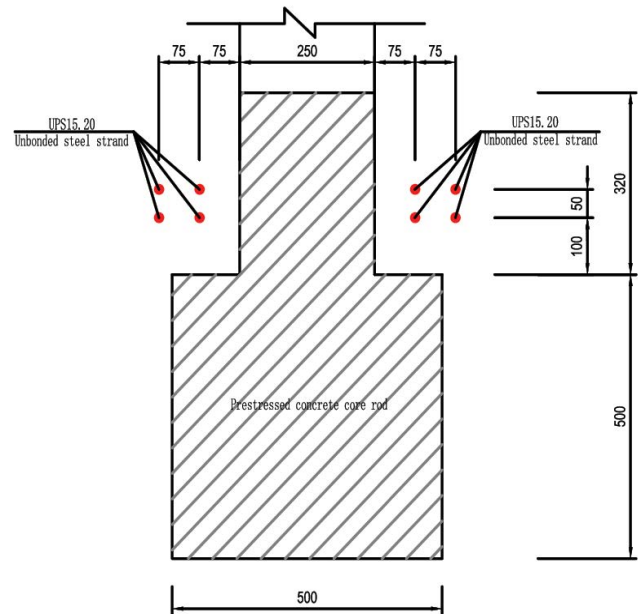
External prestressed steel strand layout drawing of T-beam (mm).
